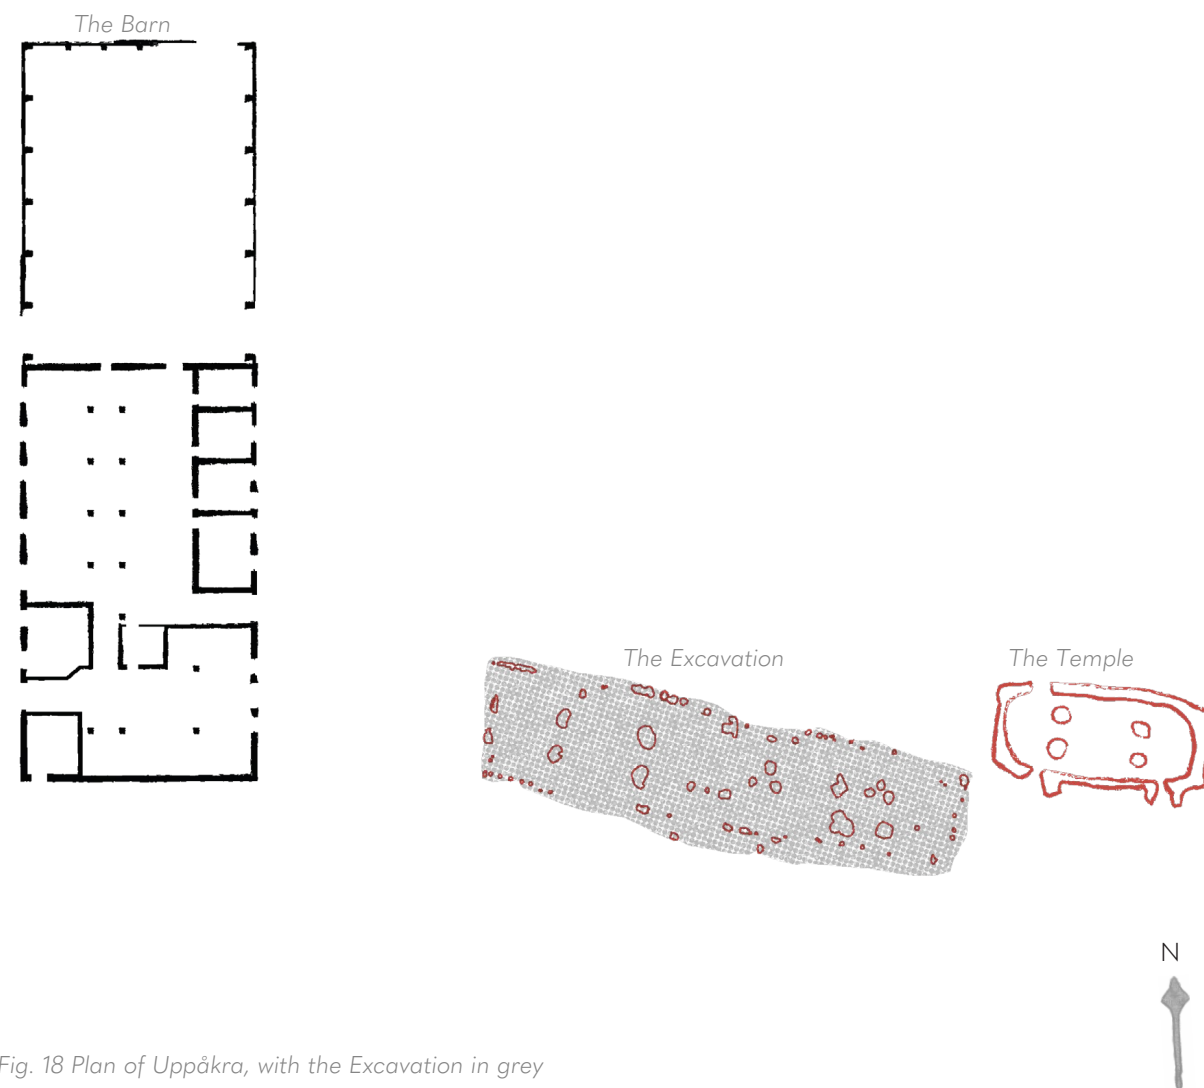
Plan of Uppåkra, with the Excavation in grey
